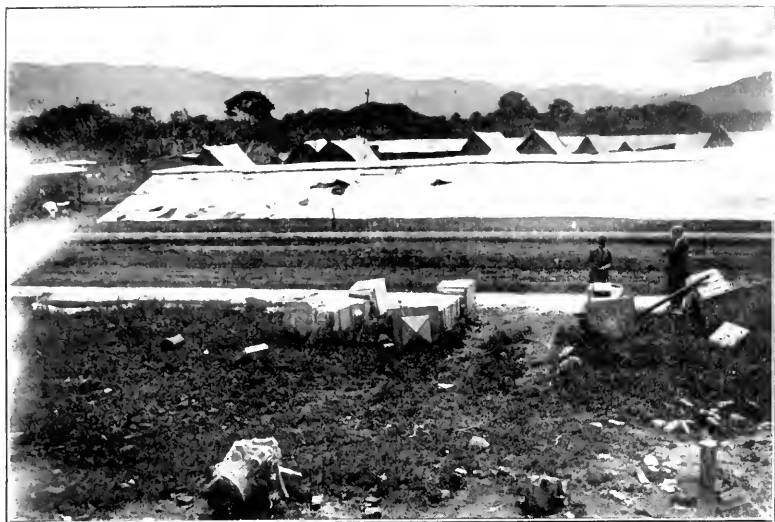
FAILURE OF WALL SURROUNDING PEACE COURT.
